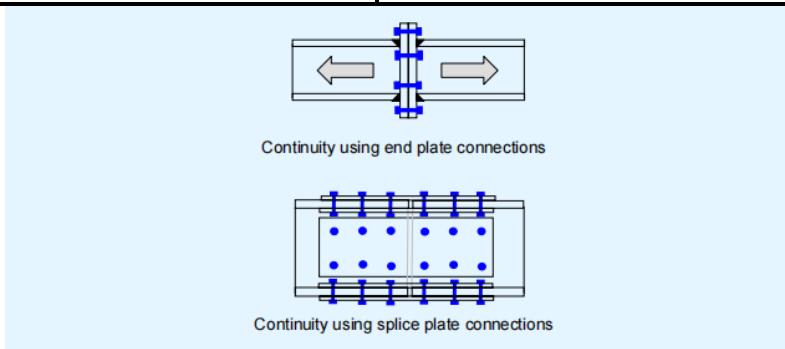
Chord Continuity. Retrieved from Figure 5.4 of Single-Story Steel Buildings Part5: Detailed Design of Trusses, p.5-48.
